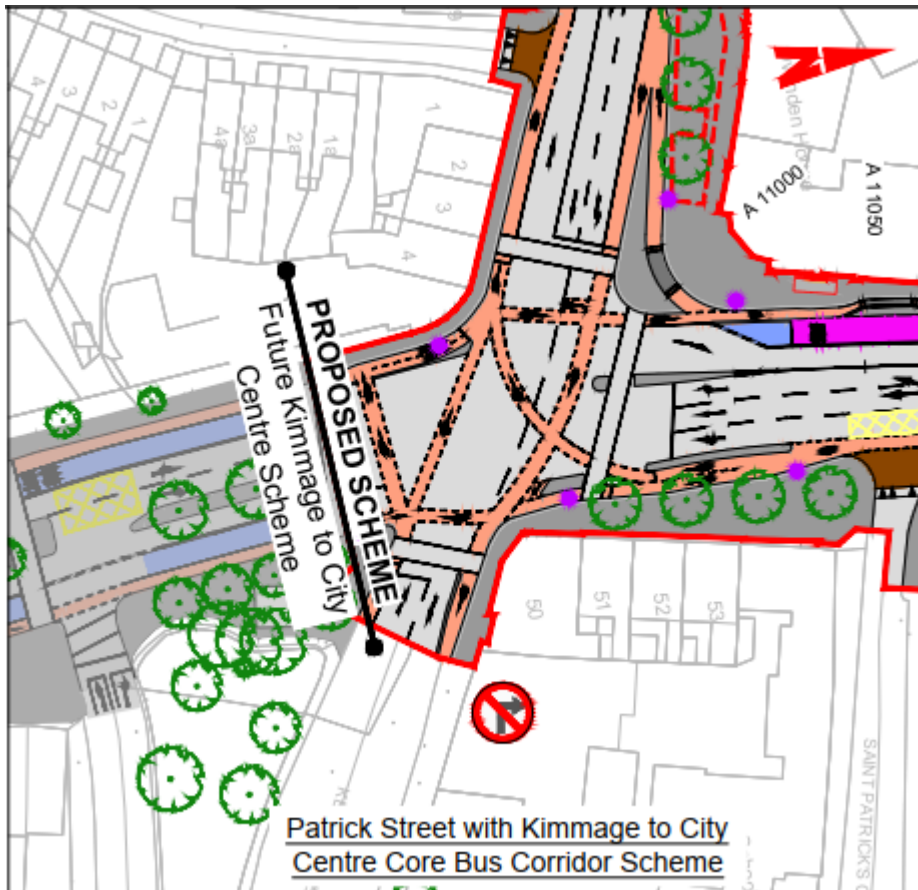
shows an extract of the preliminary design of the Proposed Scheme at the New Street South / Patrick Street junction, which ties in with the existing layout.
